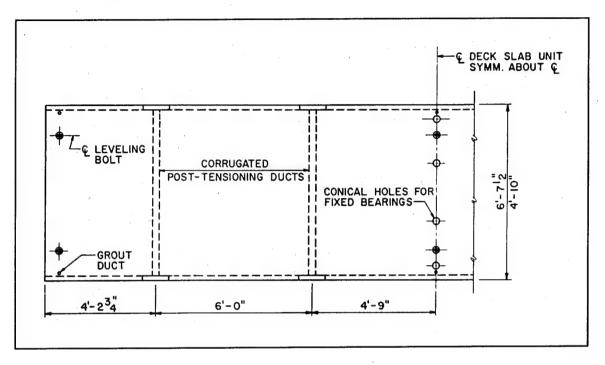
Sketch showing location of leveling bolts and posttensioning ducts, Fremont Street Bridge (from Smyers 1984)
